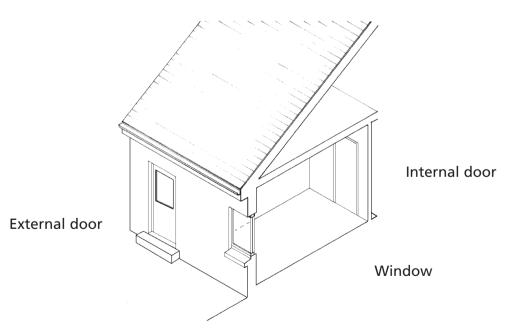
Section through typical school building, highlighting doors and windows (including internal doors).
